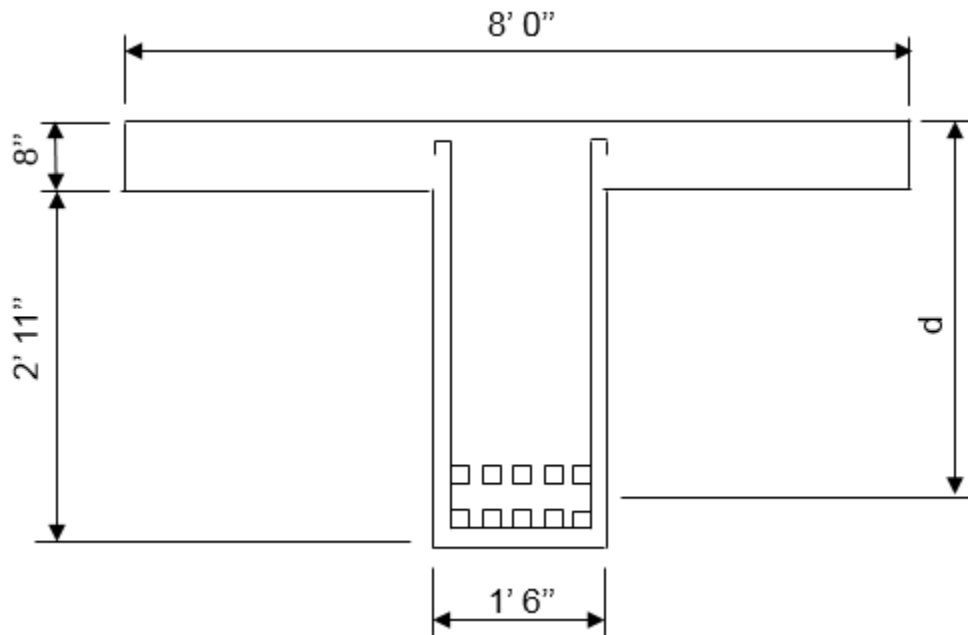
Positive Bending Moment Cross Section (Spans IV and V)
